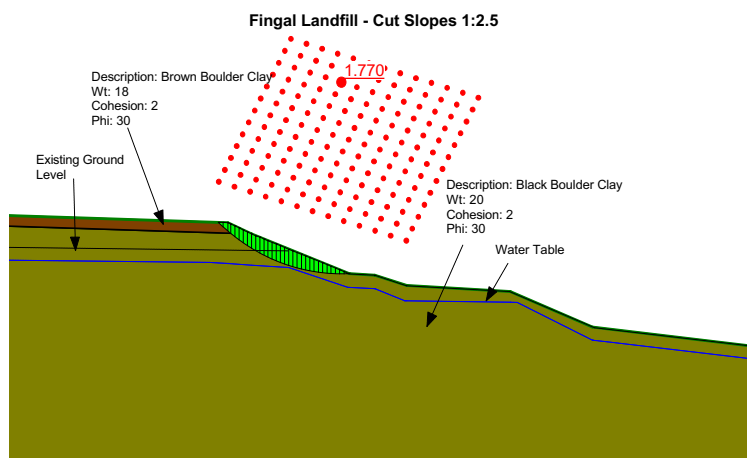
Slope Stability Analysis for Typical Cross Section of 2.5H:1V cut slope
